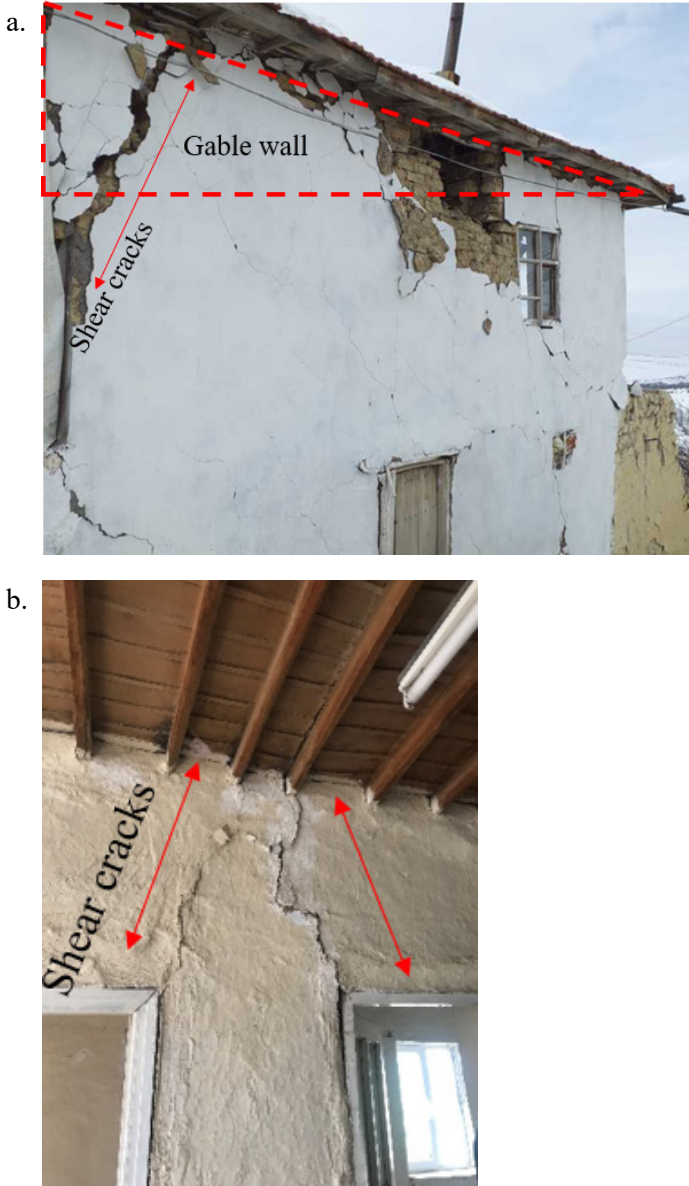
a. *Out-of-plane failure of gable wall of the roof* b. *Movement of timber joists due to lack of roof band
